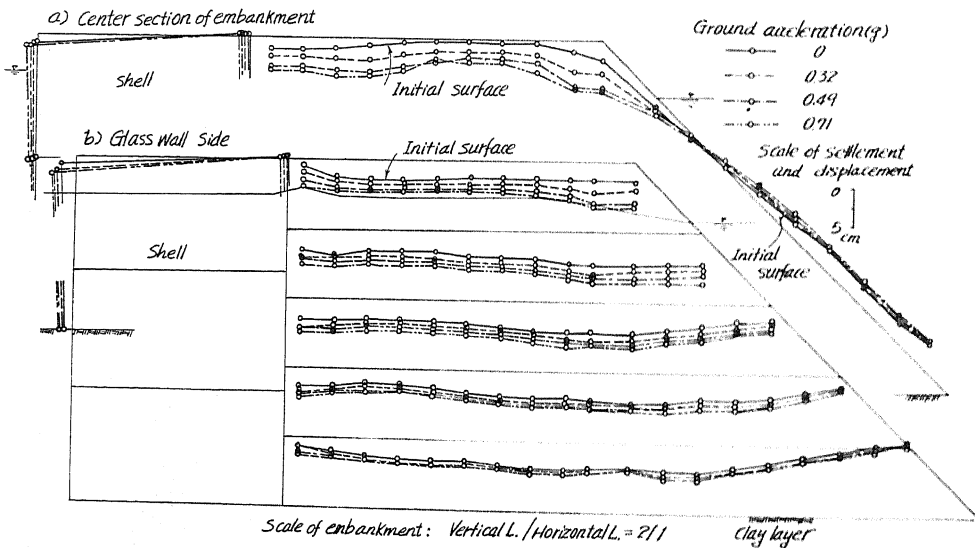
DEFORMATION OF THE EMBANKMENT.
